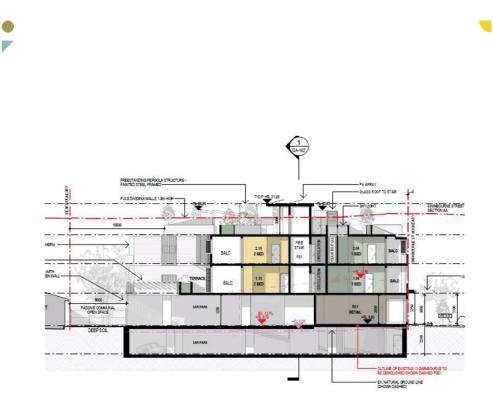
Section Plan AA (Plan Ref: DA160(J)) demonstrating height non-compliance
